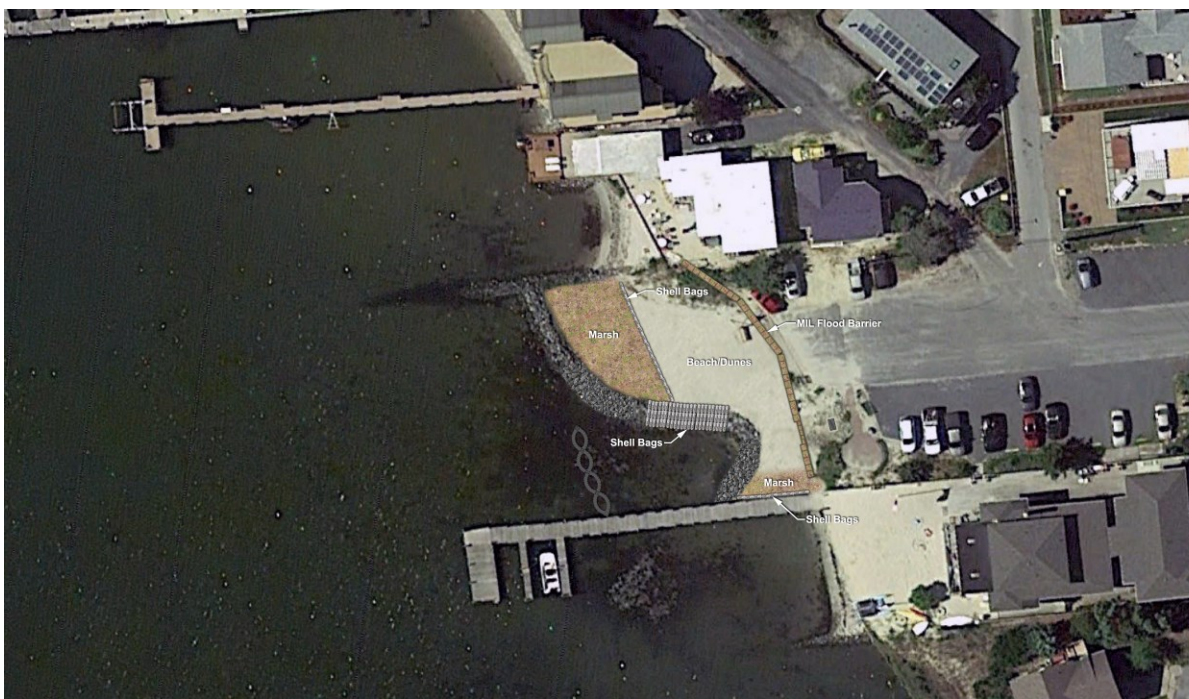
Read Avenue Conceptual Design (Plan View - Not to Scale).
